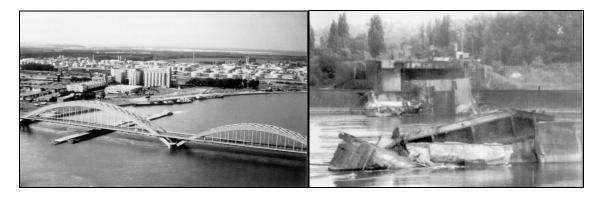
The Zezelj bridge (km 1254.17) prior to and after destruction on April 26th 1999; its prestressed concrete arch structure had 231 m and 180 m spans founded on three piers.
